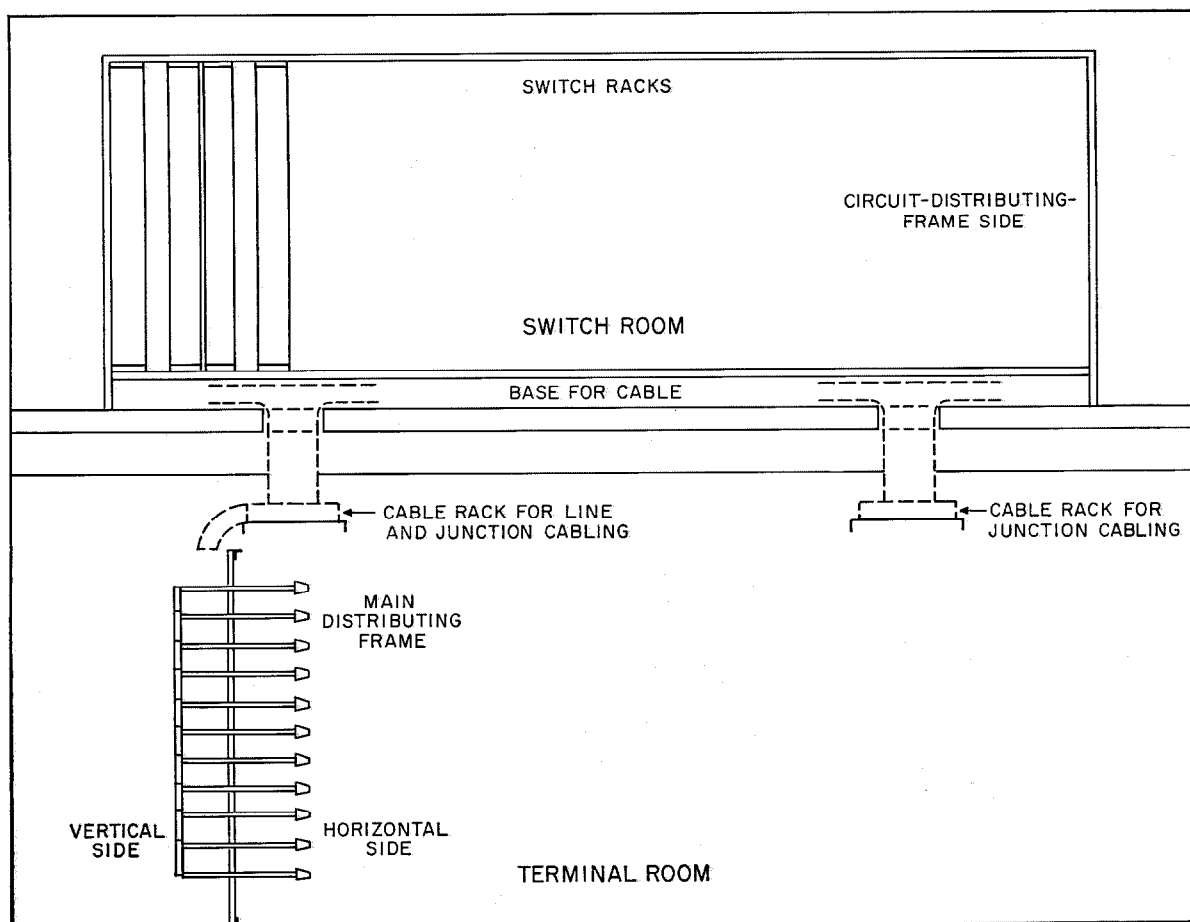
Typical method of running cables on racks attached to the ceiling of the room beneath the switch room.
